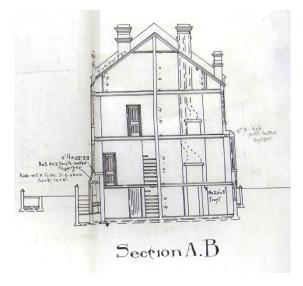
The section shows the interior doors and stairs, chimney flues, WC and garden ash pit (Carby Hall 1896a).
